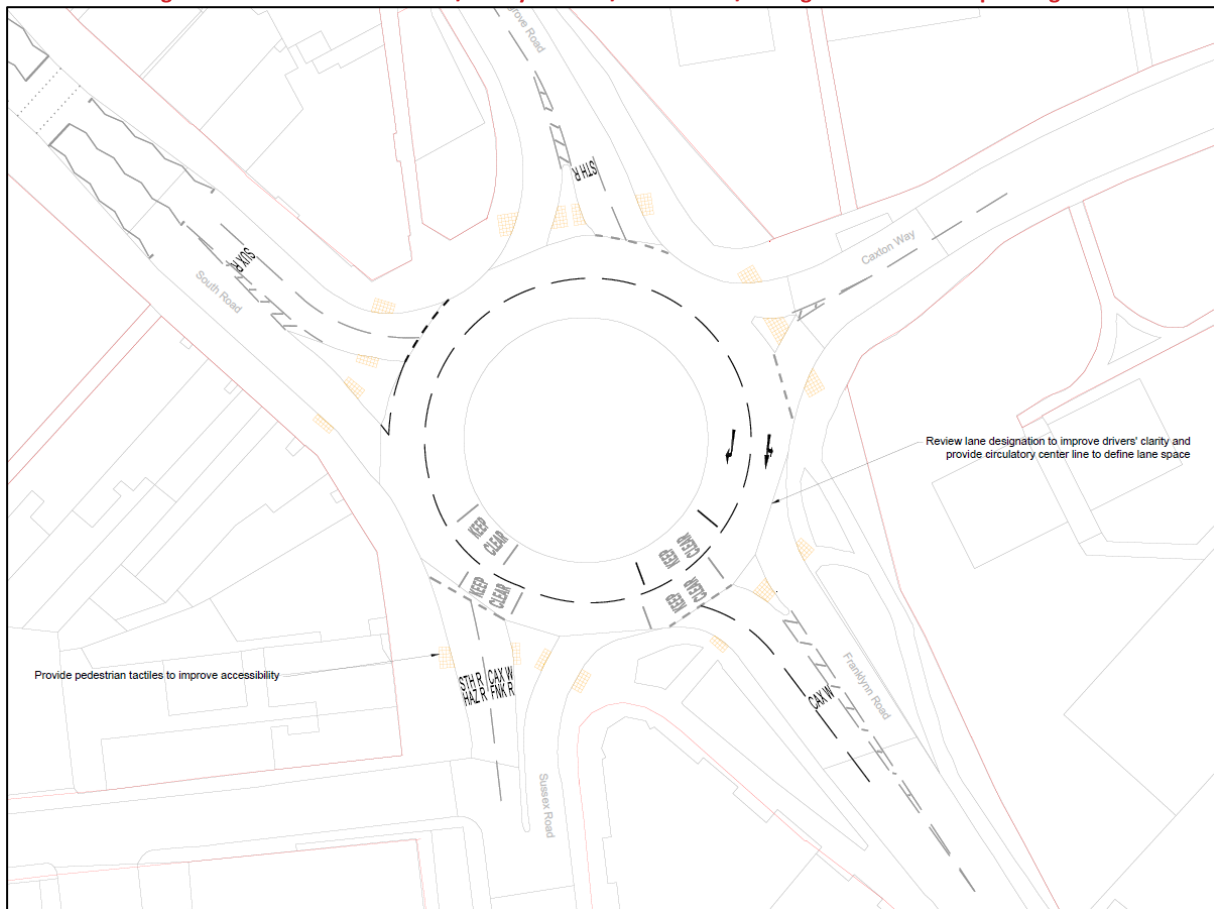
Sussex Road/Franklynn Road/Hazelgrove Road Layout/Location
